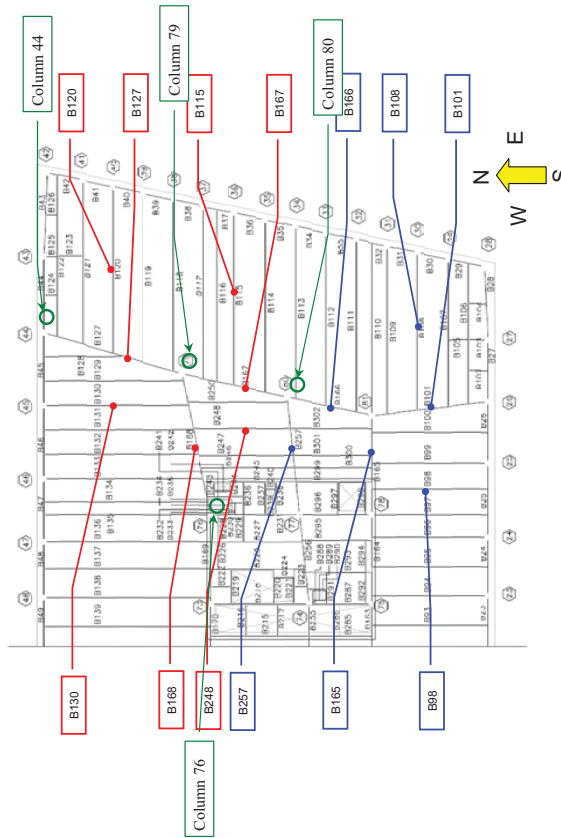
Plan view of ABAQUS model showing beam and column layout (Slab surface not rendered). Locations of key columns have been indicated.
